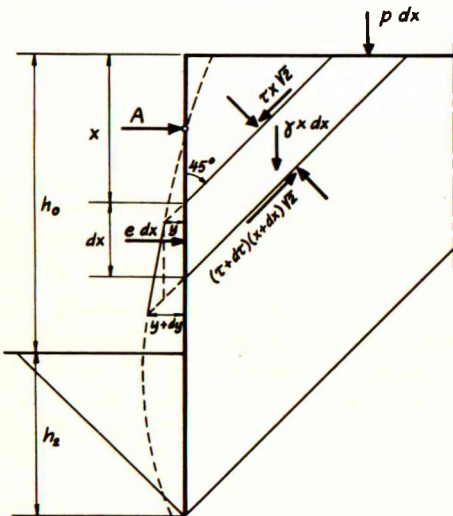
A: Bretting's method for anchored sheet walls in clay.
